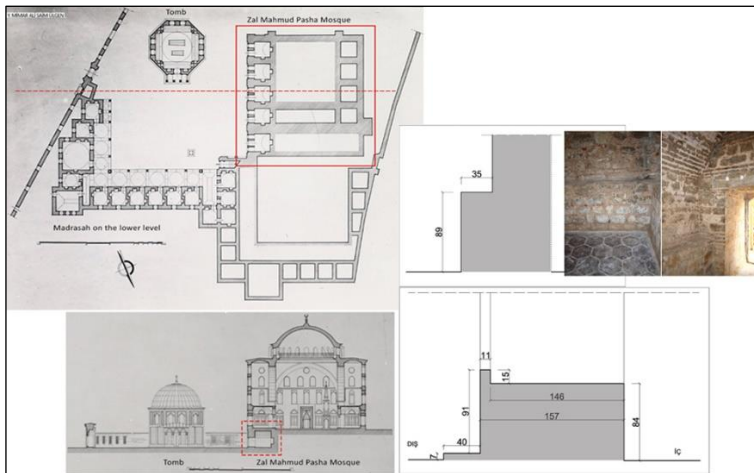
Plan and section diagrams from the lower madrasah and mosque basement; the empatements, wall thickness and window size in the basement interior
